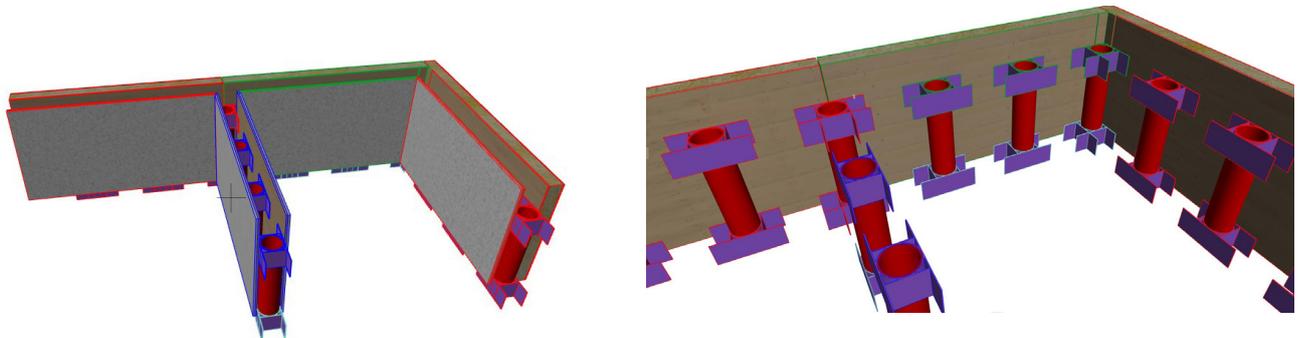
Wall panels installed in a tier (to be filled with concrete): on the left – sheets of internal and external prefabricated finishing; on the right – tubes of internal PTCC columns with installed intermediate elements.
